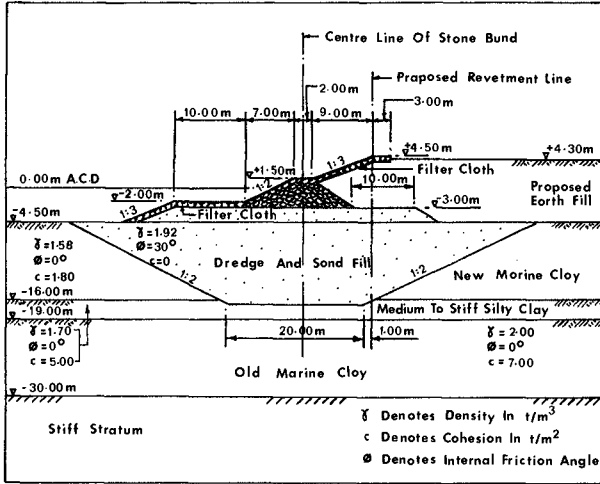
TYPICAL SECTION OF SEA REVETMENT
